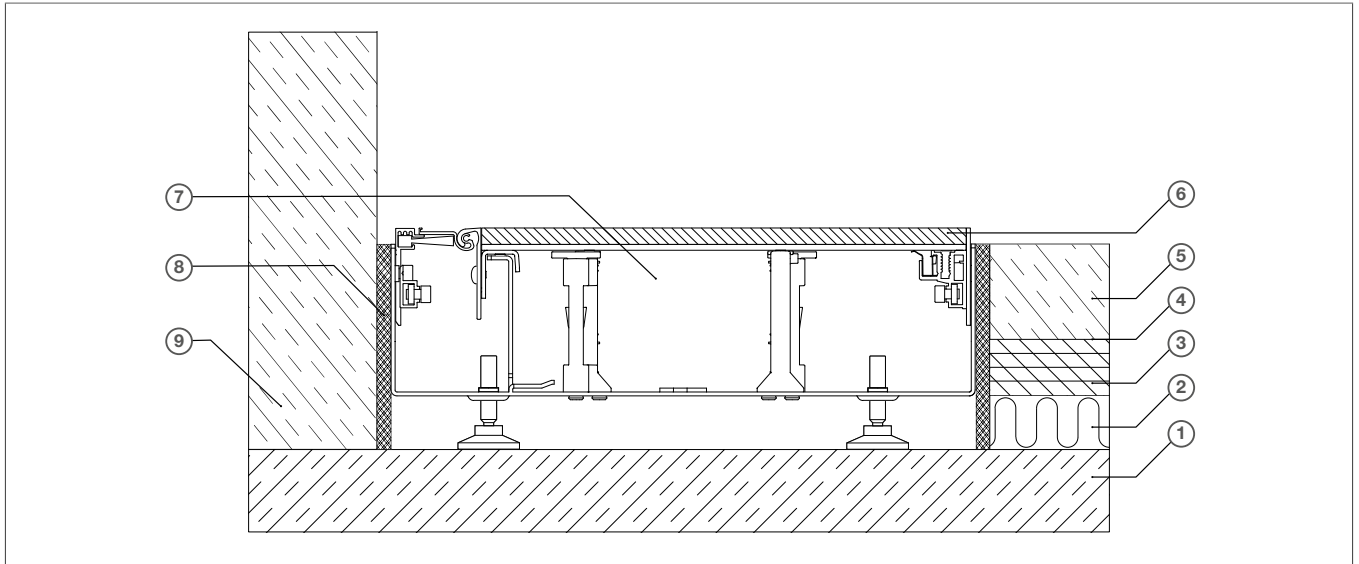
Concept drawing of the test setup for the BKBx floor trunking with brush outlet on the ceiling test station
